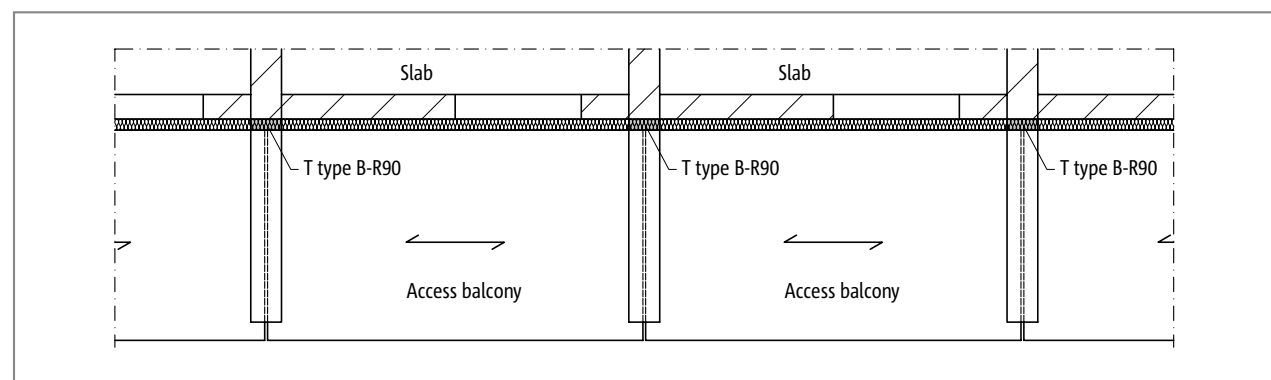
Schöck Isokorb® T type B-R90: Room-closing passageway walk
